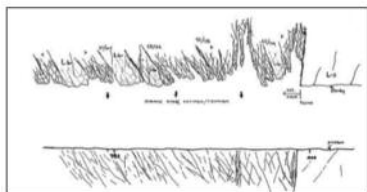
Longitudinal tunnel section across the fault zone at ch. 400.
